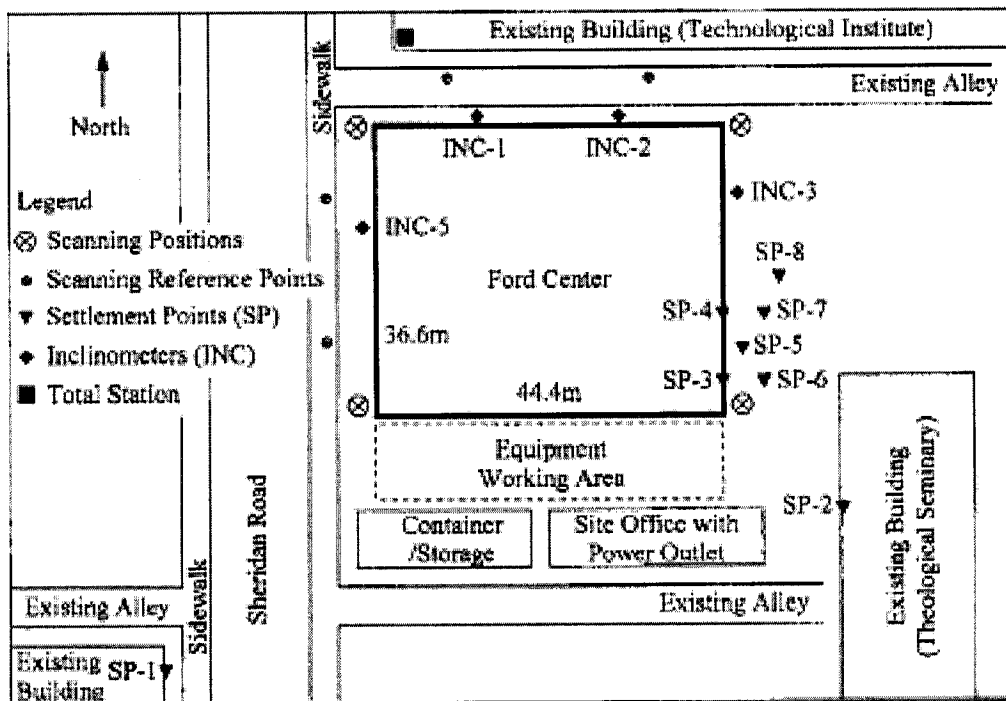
Scanning and surveying site layout (Su et al 2006)
